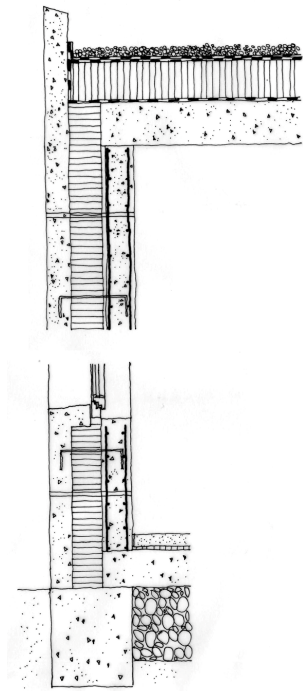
Construction section highlighting the added complexity to achieve a lower U-value in the MisaporConcrete core insulating system
